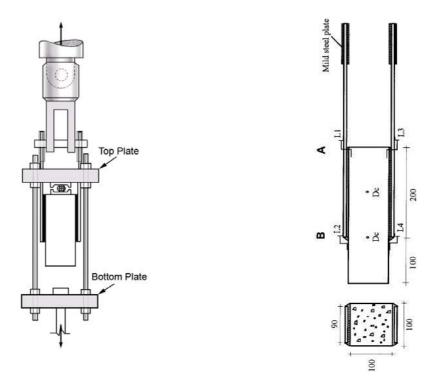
Test rig and specimen geometry used by Mukhopadhyaya et al. [10]
